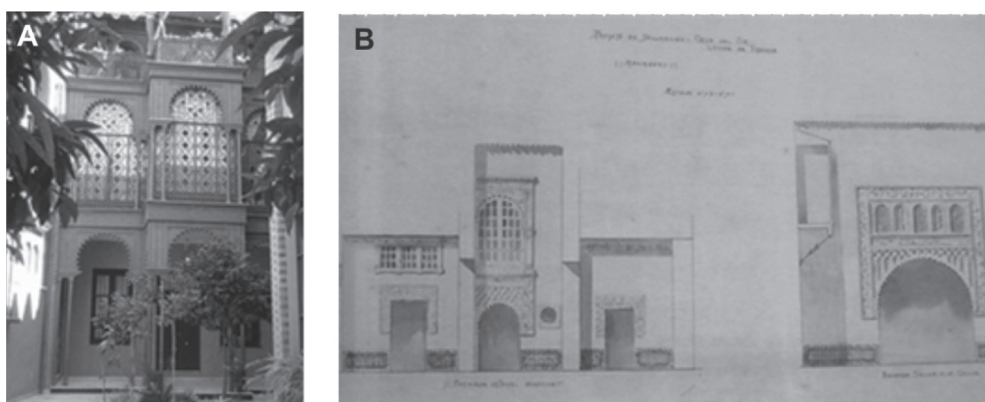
(a) Reform of the House of Mr. J. Bautista Calvi Rives, Placentines Street, 1. Patio. (b) Project House Reform of Count de Ybarra, Anibal Gonzalez (1921).
